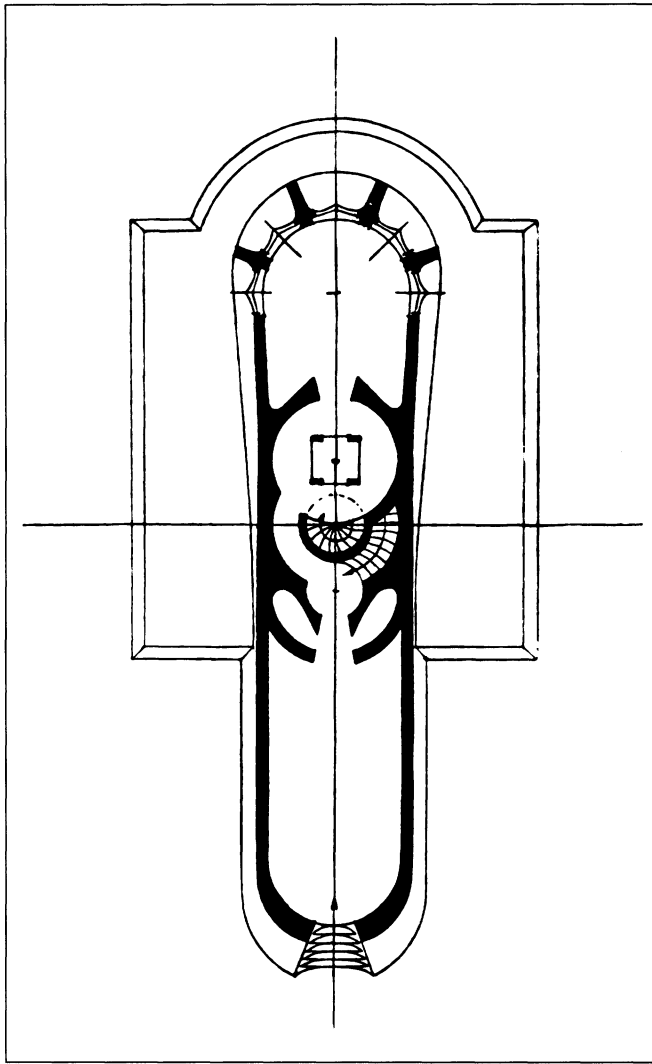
Erich Mendelsohn, first-floor plan of Einstein Tower, 1919, showing a larger porch and shorter underground laboratory than were eventually built.
